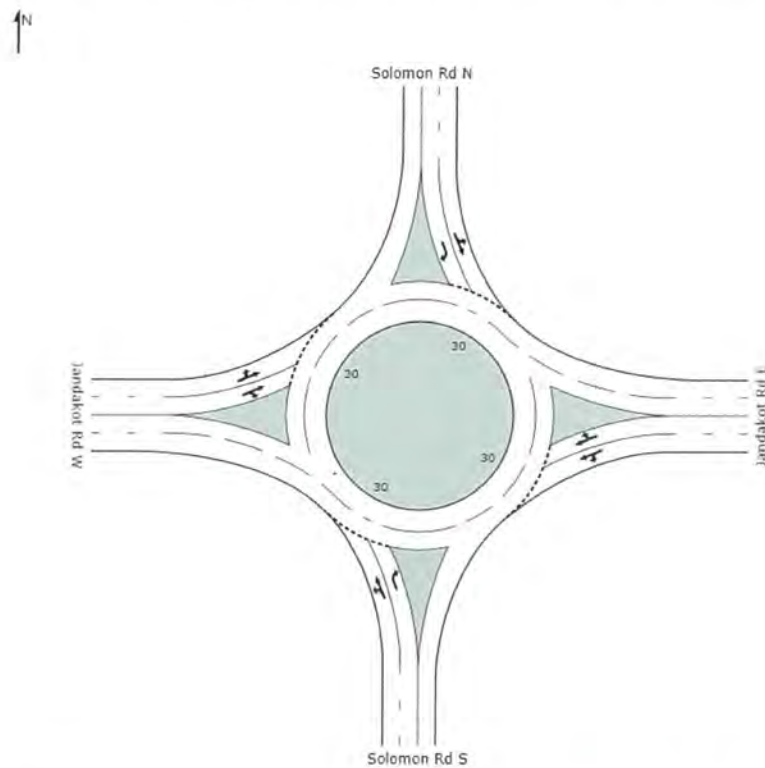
Proposed Roundabout at Jandakot Road/N-S Spine Road
